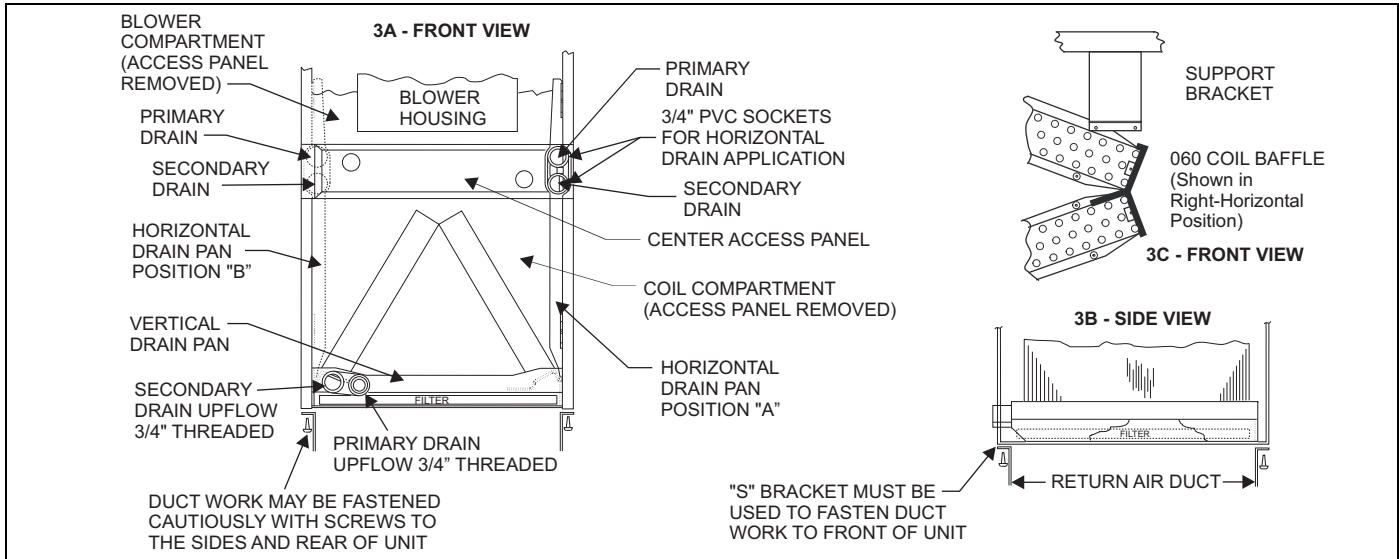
Filter Access & Drain Pan Conversion / Coil Baffle
